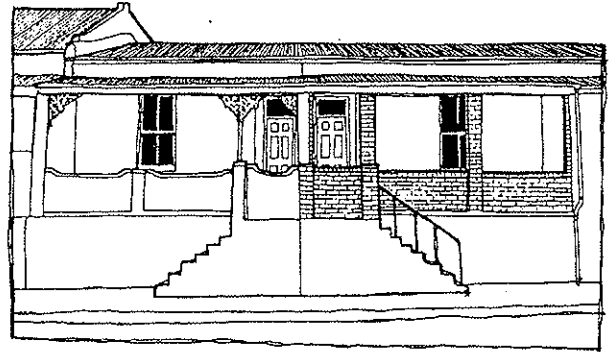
Facebrick walls and columns are not compatible with the architecture and should preferably be plastered and painted.
